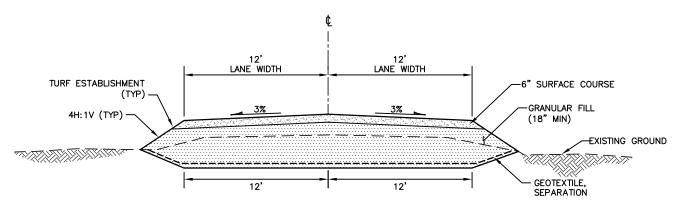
DEERING, ALASKA WEST AIRPORT ROAD PROJECT TYPICAL SECTIONS
